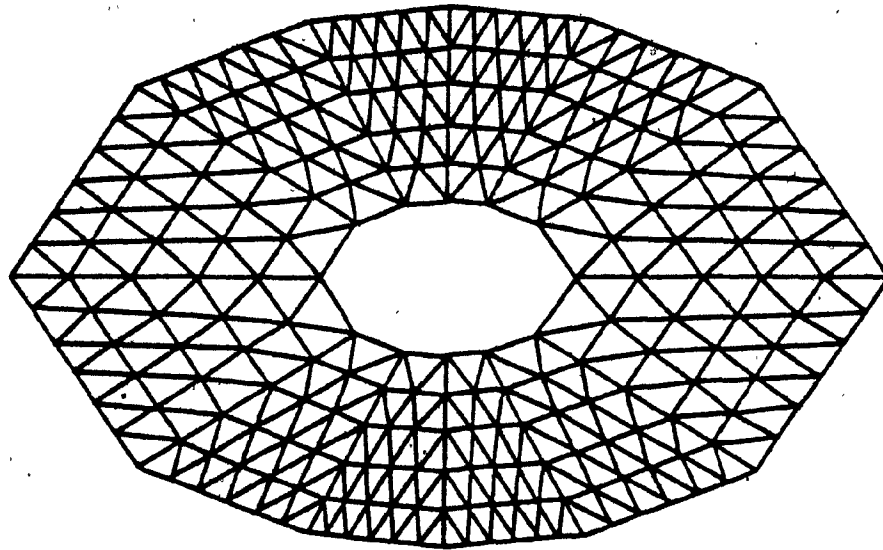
PLAN VIEW OF AN ELONGATED DODECAGONAL RING TRUSS WITH SIX EQUALLY SPACED RINGS. THE BRACING TRUSSES HAVE BEEN OMITTED.
